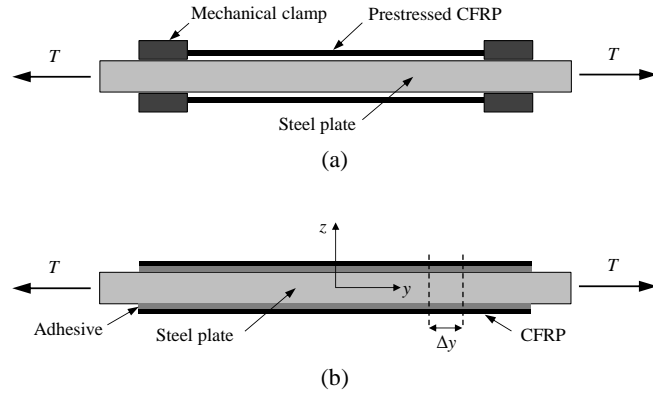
Schematic view of: (a) prestressed unbonded reinforcement (PUR) and (b) prestressed bonded reinforcement (PBR).
